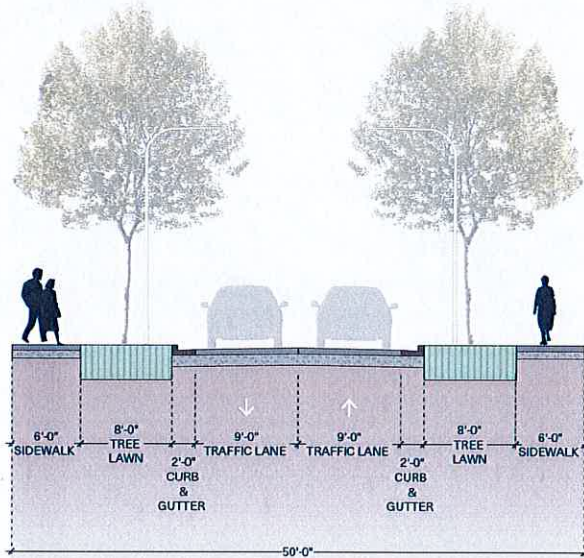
Residential Local Street Section - Low-Density Neighborhood
